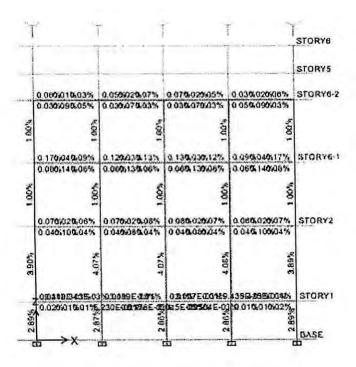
Required rebar percentage of frame members of a typical cyclone shelter funded by Saudi Arabia
